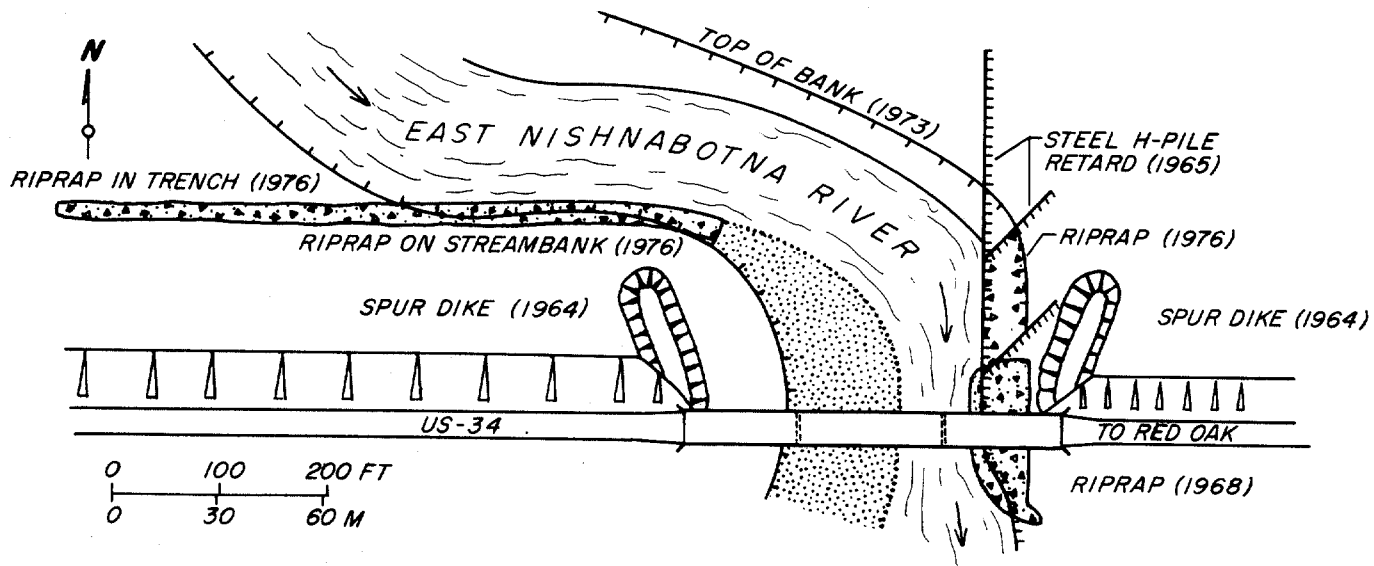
Plan sketch showing countermeasures at US-34 crossing.
